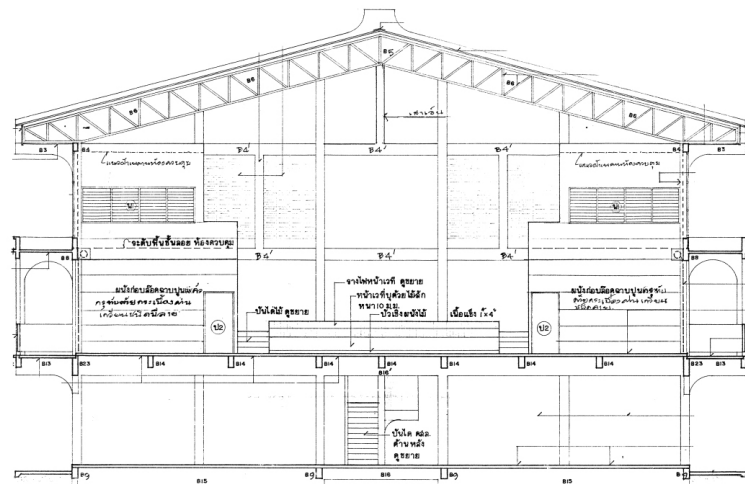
The standard architectural section of the basic meeting hall office of the Education Committee, Room 101, Building 2
